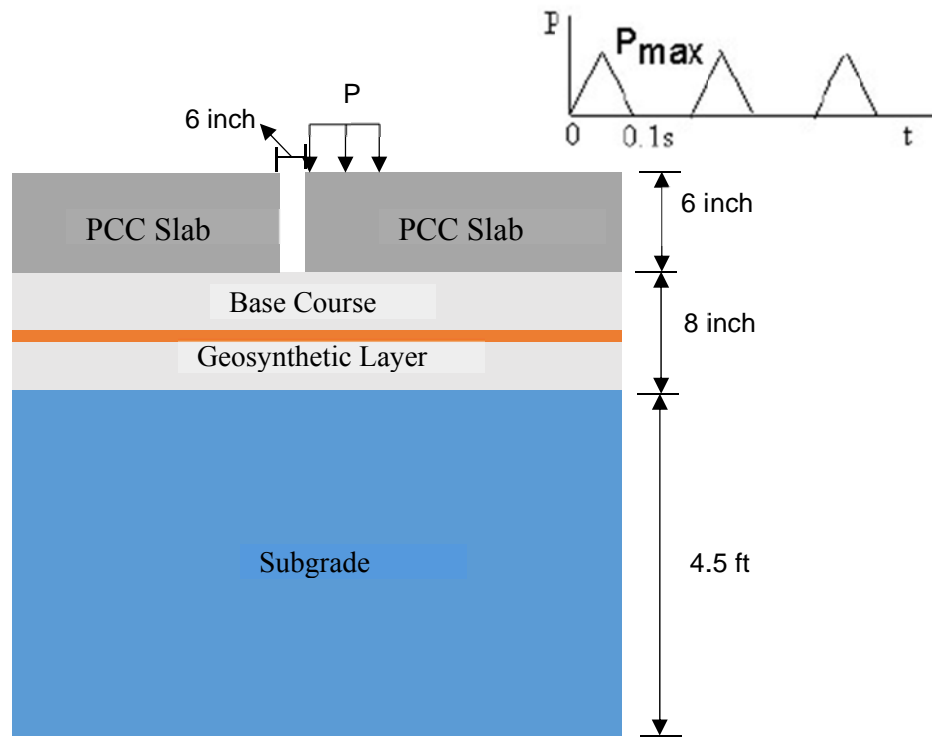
Typical Geosynthetic-Reinforced Rigid Pavement Structure in LST Test
